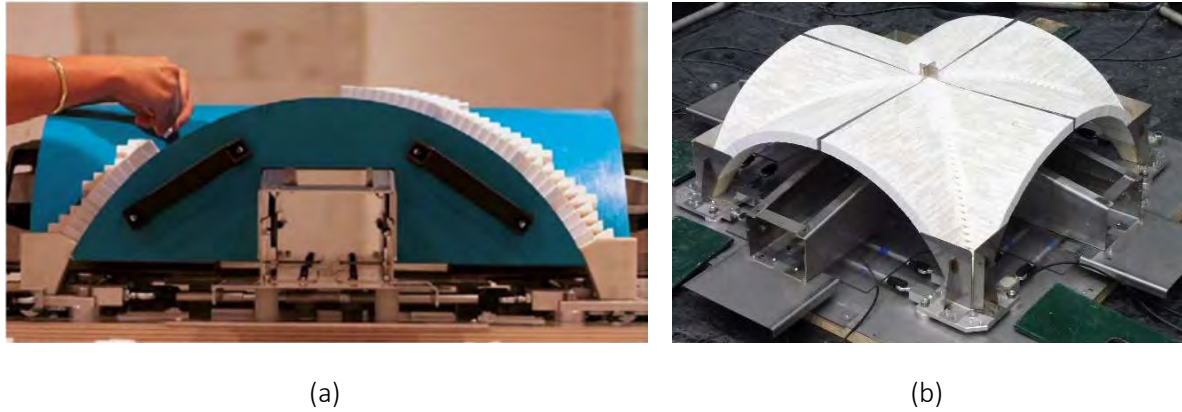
(a) Details of the construction on the plywood scaffolding and (b) the model fully assembled
